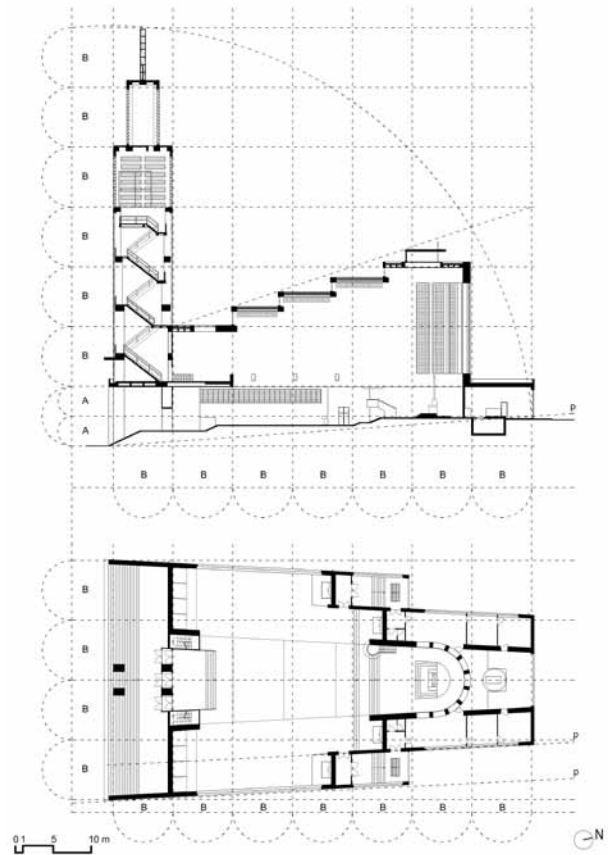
J. Gočár, Church of Saint Wenceslas in Prague, Vršovice, 1928–1929, re-drawing of ground floor plan and longitudinal section
